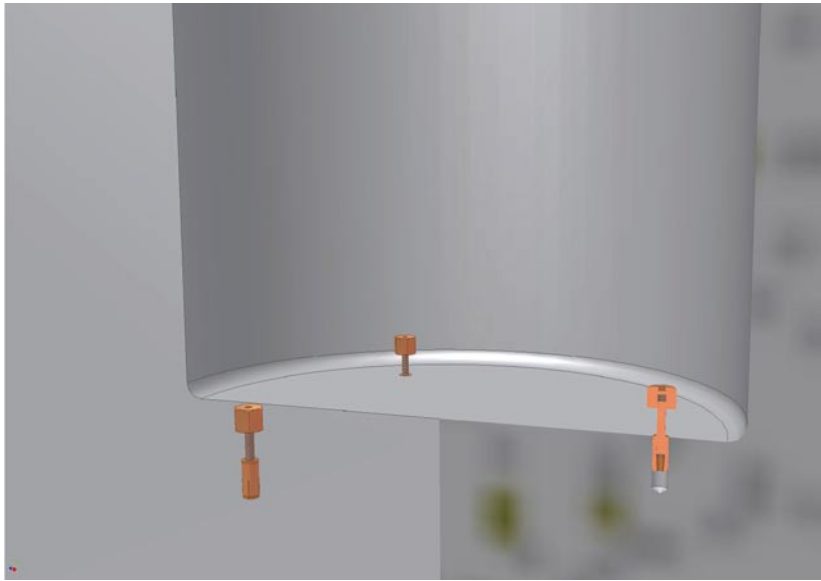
Sockets for mounting of HKD tube. Half the bottom of a deposition hole viewed in section.
